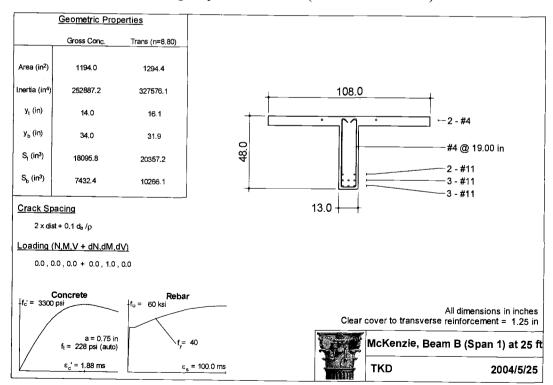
McKenzie R. Bridge; Span 1 at 25 ft. (RESPONSE 2000TM)
